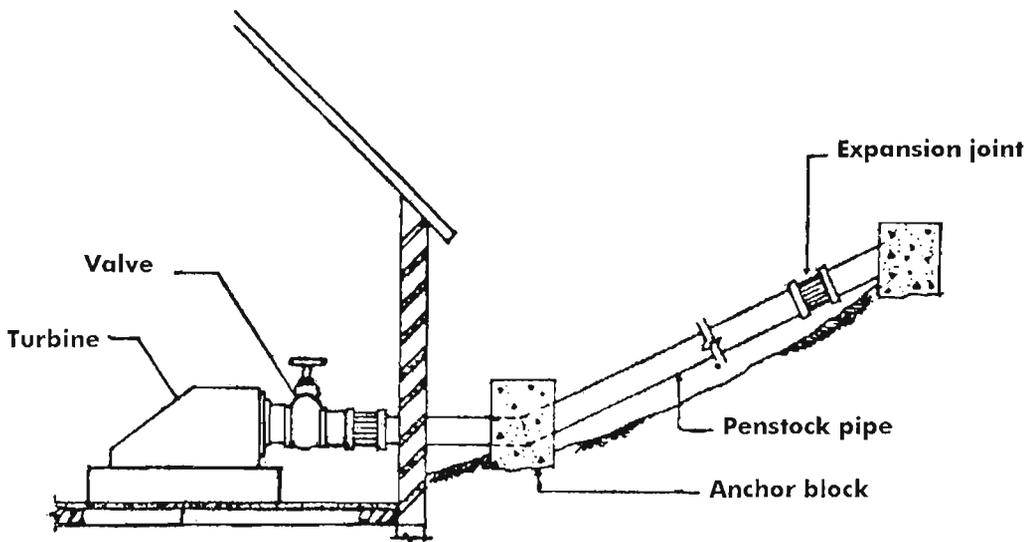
Cross-section through a Powerhouse and Anchor Block
